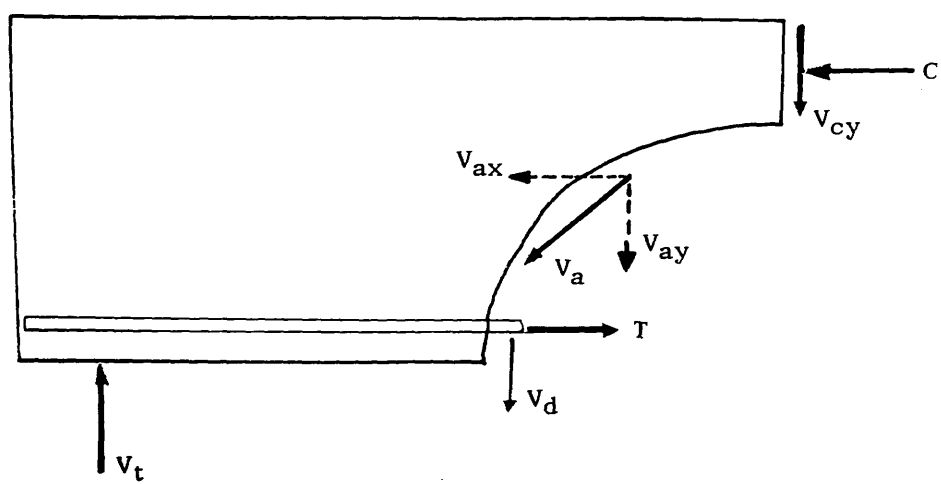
FORCES ACTING AT INCLINED CRACK
